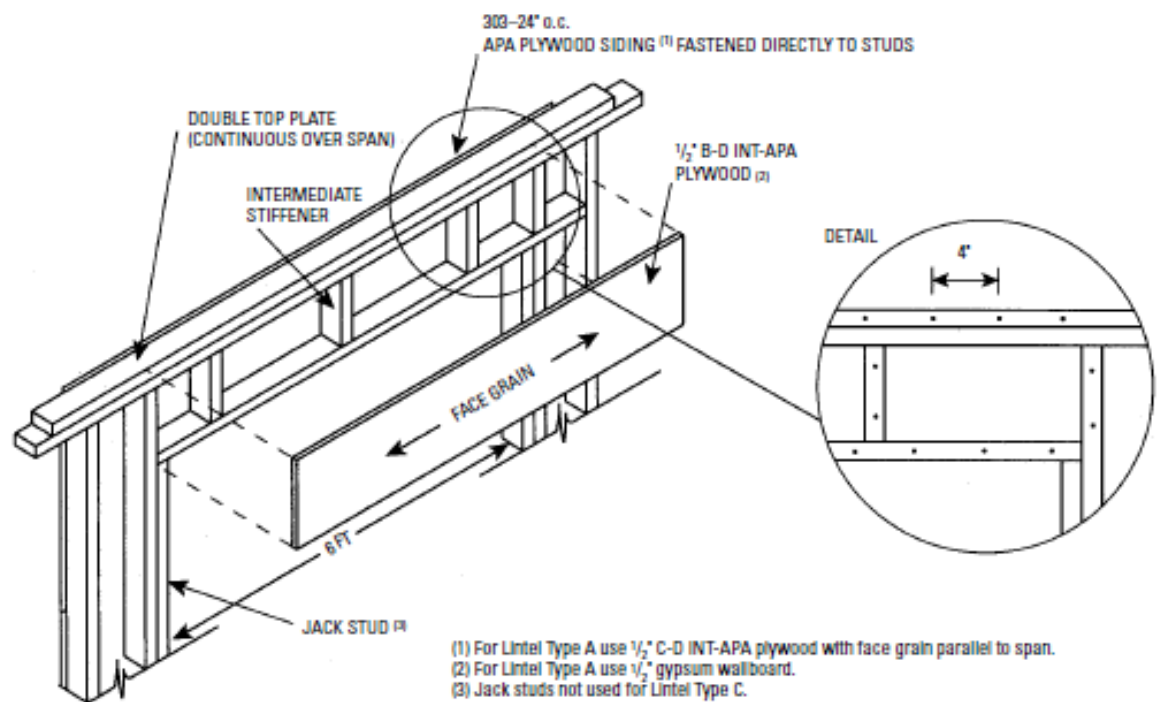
Plywood box beams or box beams. (Courtesy American Plywood Association)
